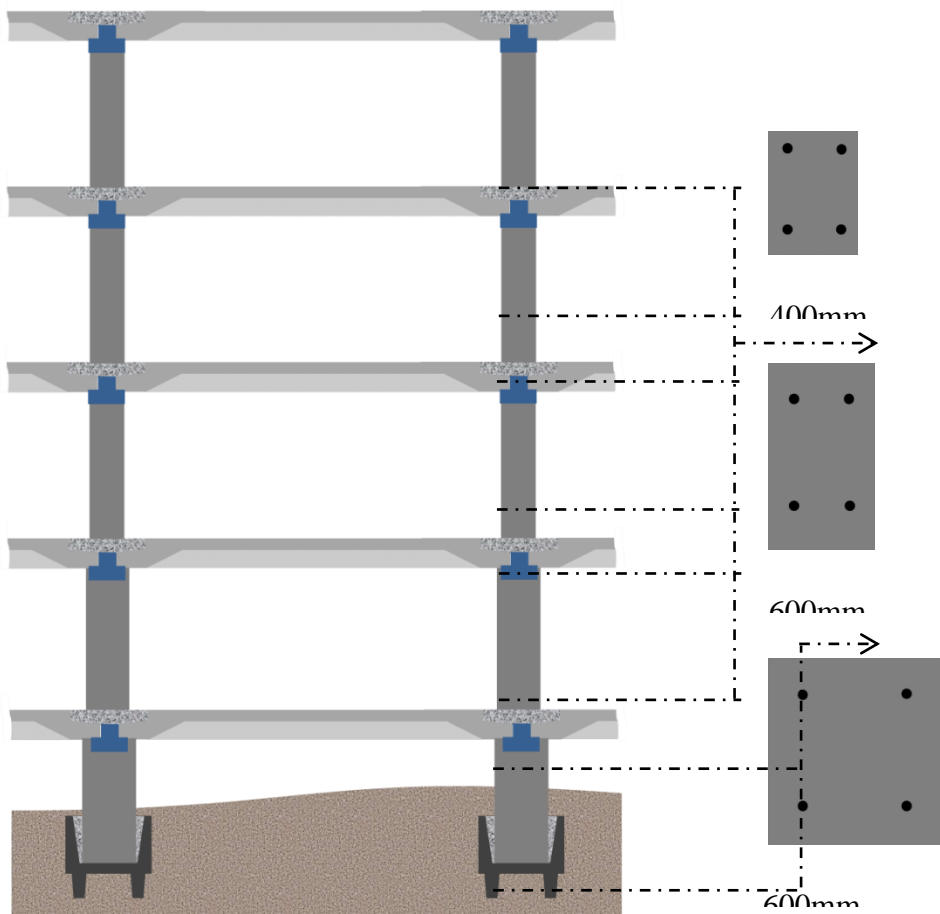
assessed building: typical dimensions of the pedestals and columns. Only 4 steel bars were used to connect the pedestals and columns to the beams
